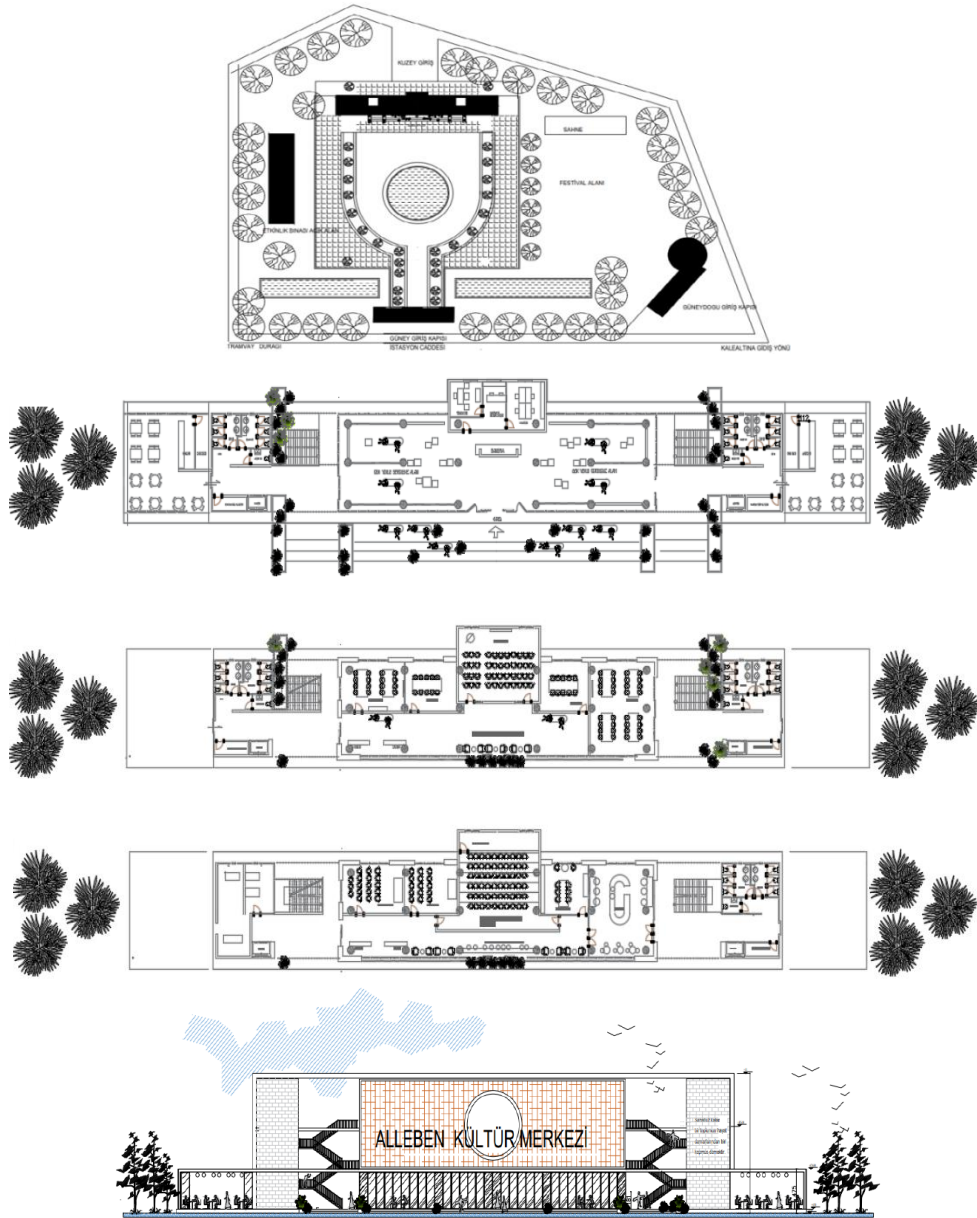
Gaziantep Old Fair Building, Design Proposal for Alleben Cultural Center
